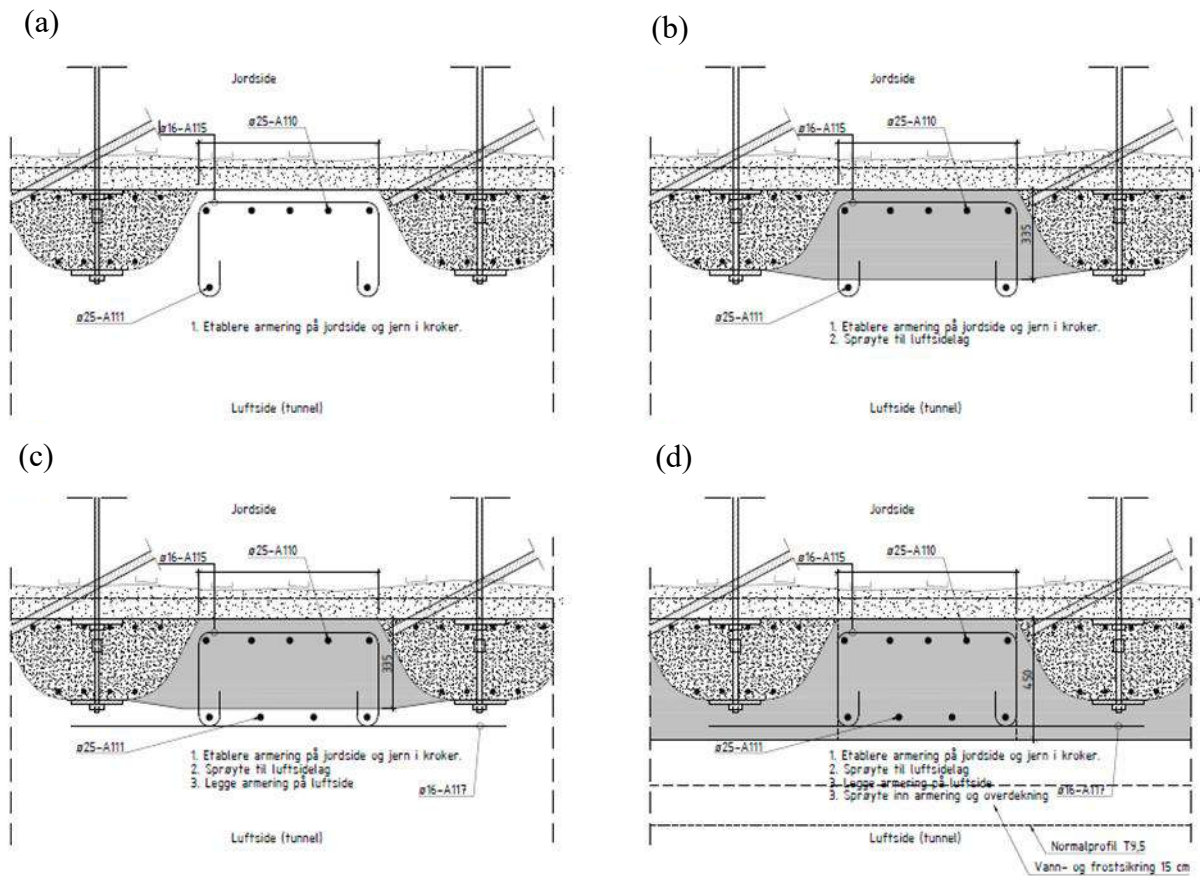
Sequential construction of permanent tunnel arches: (a) initial reinforcement installation, (b) first sprayed concrete layer, (c) additional reinforcement placement, and (d) final sprayed concrete application over reinforcement and temporary arches
